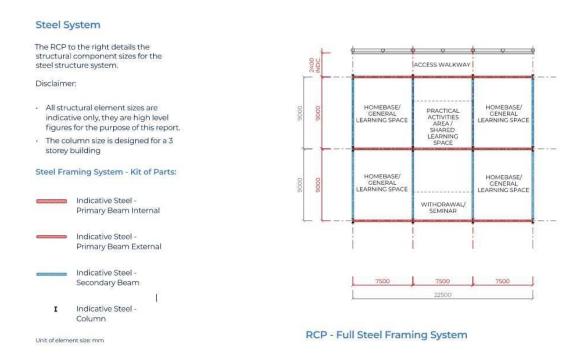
Reflected ceiling plan (Extracted from SINSW DFMA Guideline)
